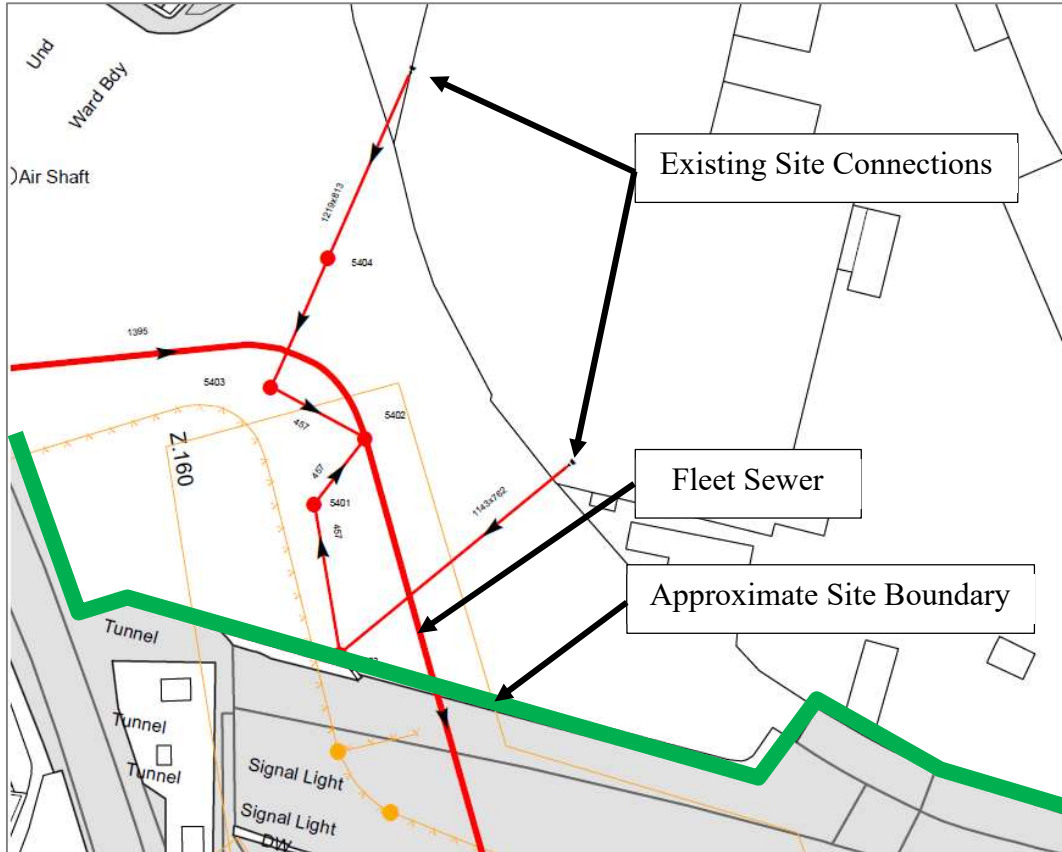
Fleet Storm Relief Sewer Encroaching Site Boundary
